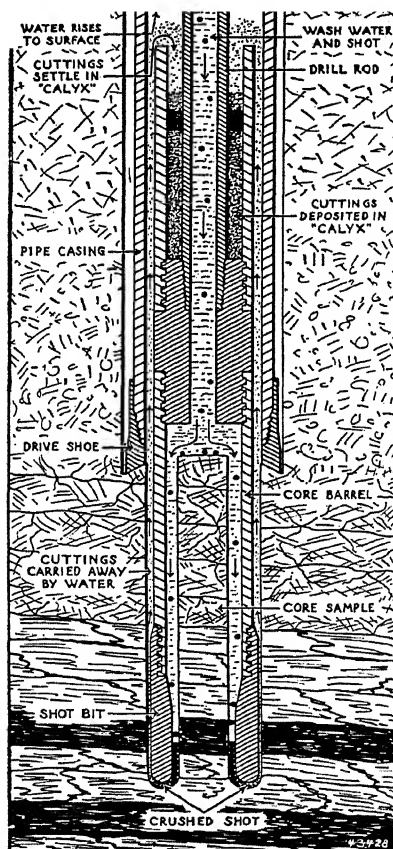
Shot drill showing calyx shot bit, drive shoe, and core sample. (Jacoby and Davis, *"Foundations of Bridges and Buildings,"* 3d. ed.)
